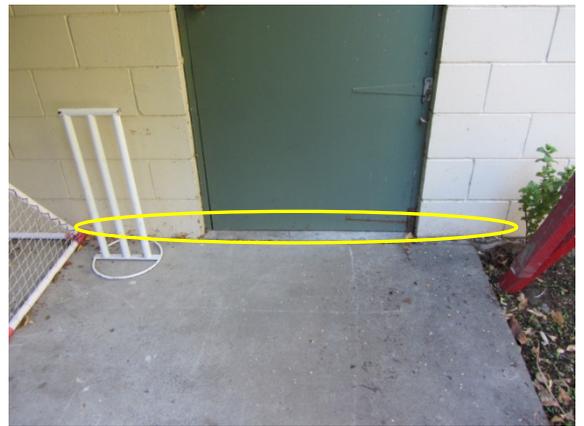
Gap Between Concrete Patio and Building along North Side of Building
